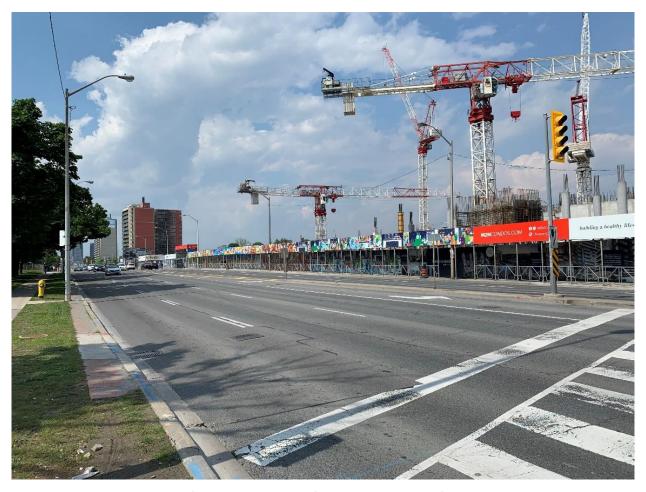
Facing Northeast from the West Side of Yonge Street Across from Turnberry Court, Proposed Finch Station Transition Box Structure location within the Yonge Street right-of-way
